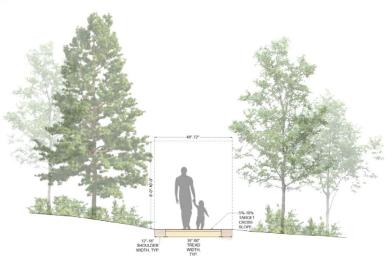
CLASS 4 MULTI-USE TRAIL ELEVATION
